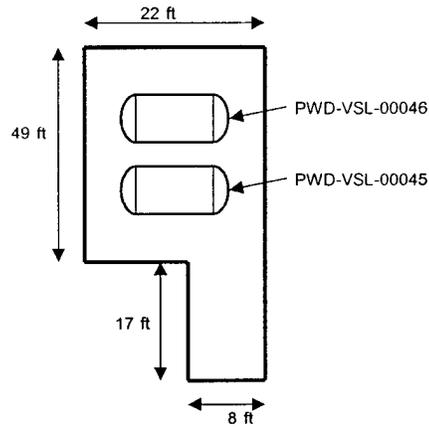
, C2/C3 Floor Drain Pit (Plan)
